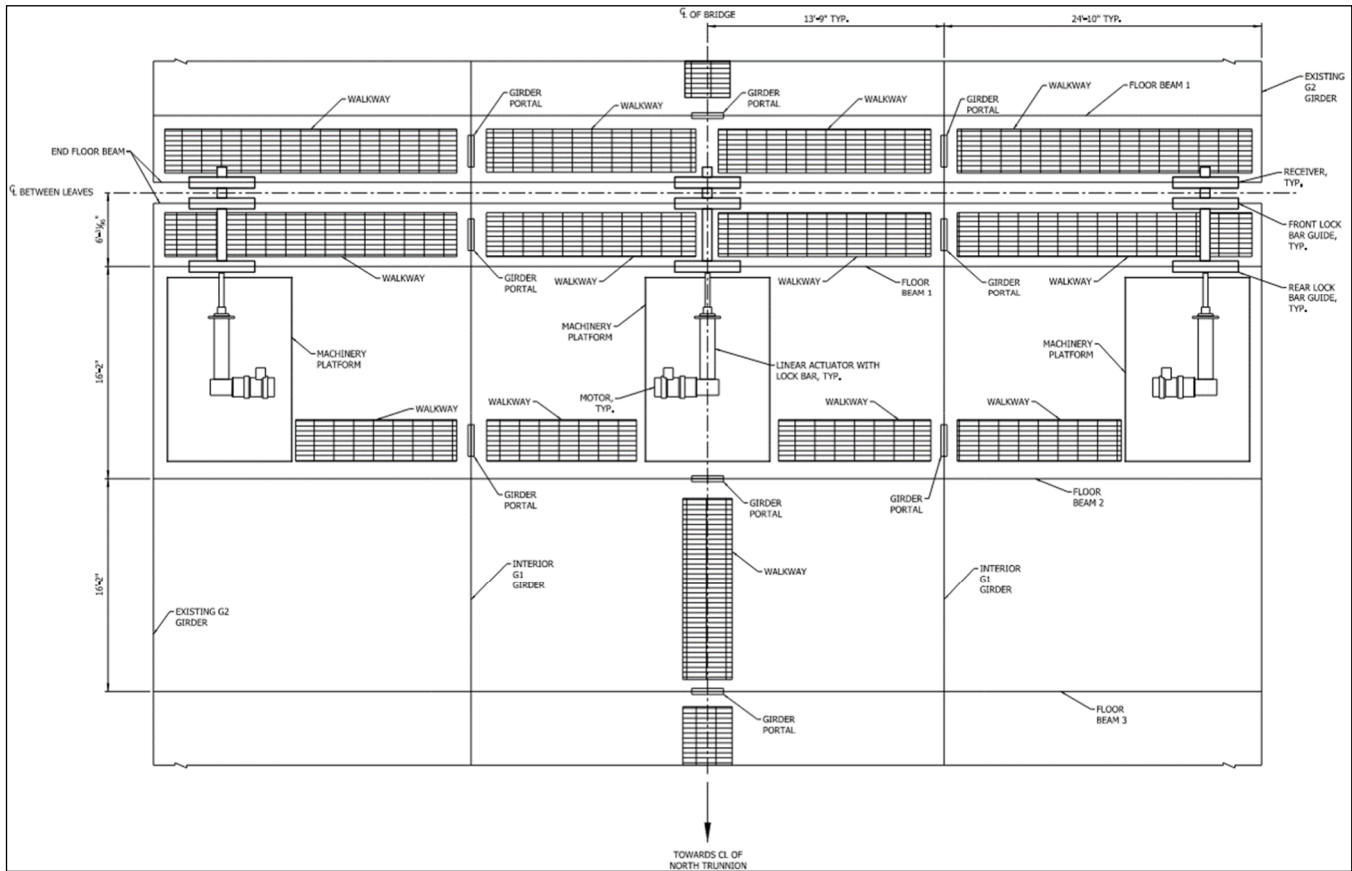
Sample Span Lock Machinery Layout
